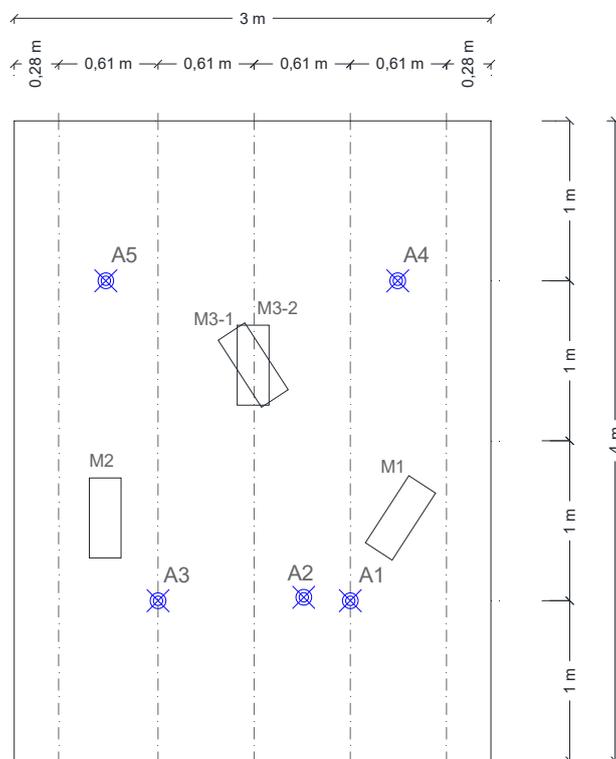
Timber concrete floor with sources and measurement positions (plan).
